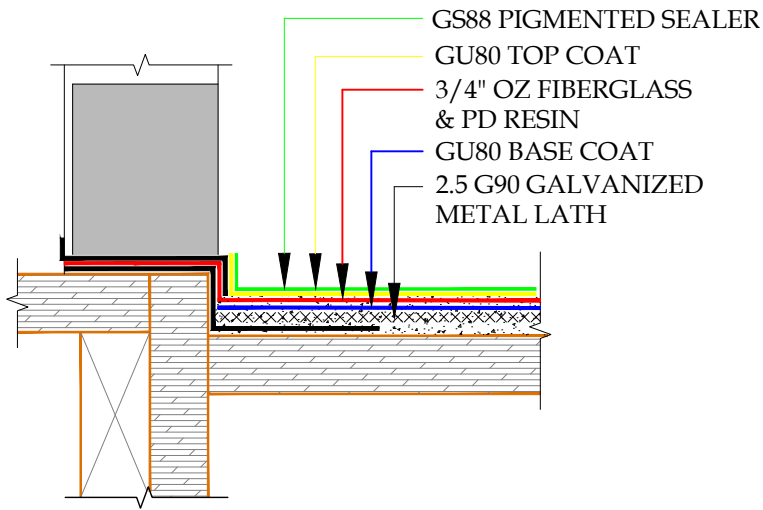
DETAIL-THRESHOLD FLASHING-TWO PIECE DOOR PAN FLASHING - INCLEMENT WEATHER
